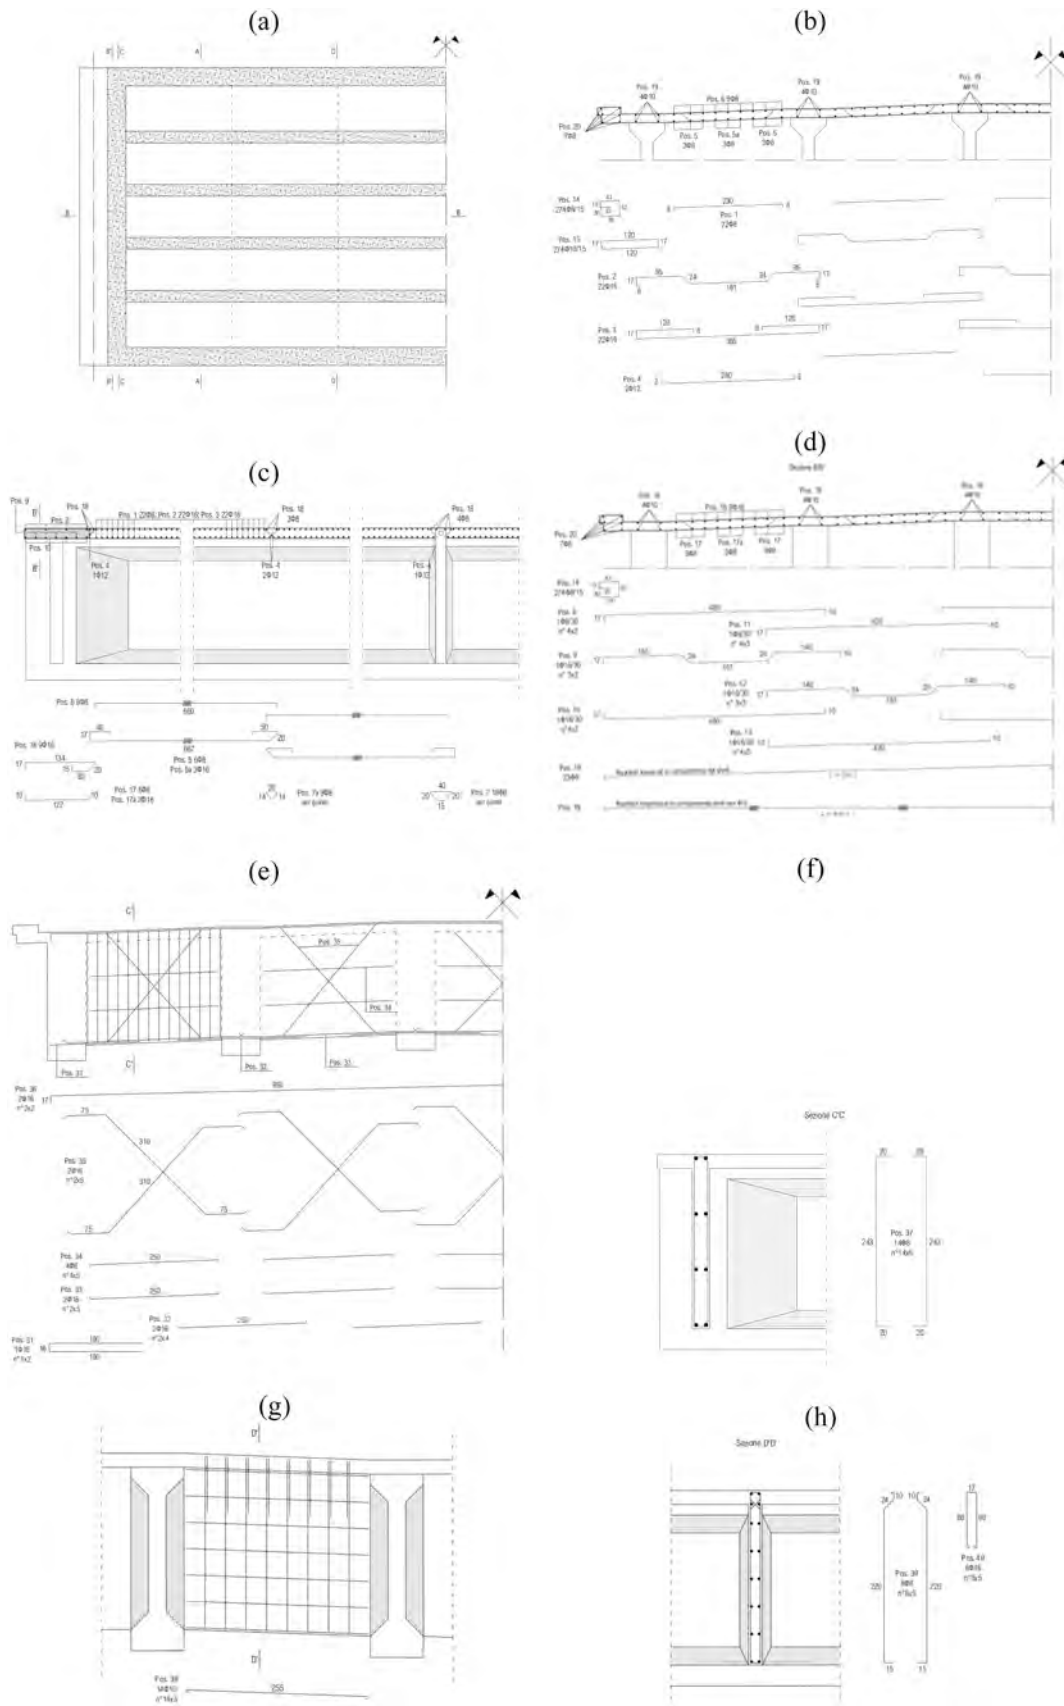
Ordinary reinforcement arrangement in the slab and transverse beam: (a) planimetry, (b) section A-A, (c) section B-B, (d) section B'-B', (e) section C-C, (f) section C'-C', (g) section D-D, (h) section D'-D'. Measurements in centimetres with diameters in millimetres.
